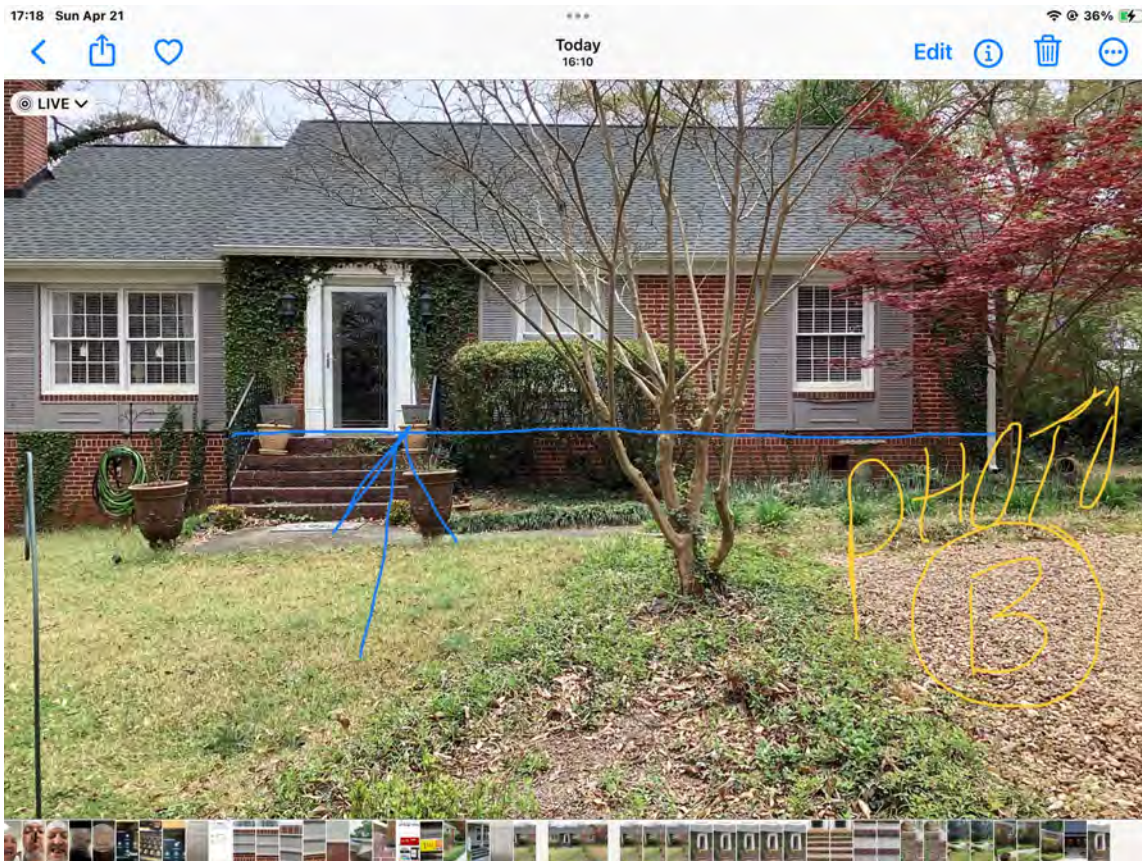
PHOTO SHOWS PORCH WIDTH OFF OF HOME AND EVEN WITH CONCRETE WALKWAY (APPROX. 11FT)
